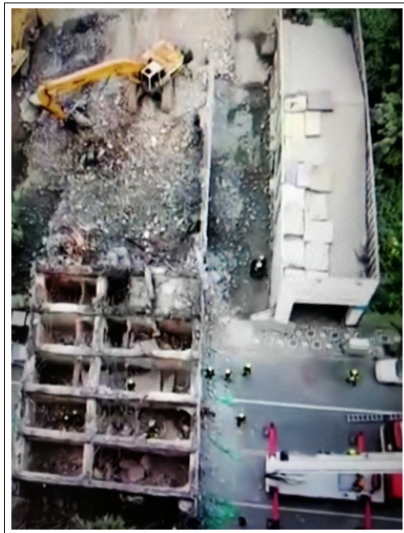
Shows a collapsed building during maintenance due to remove several concrete columns.
